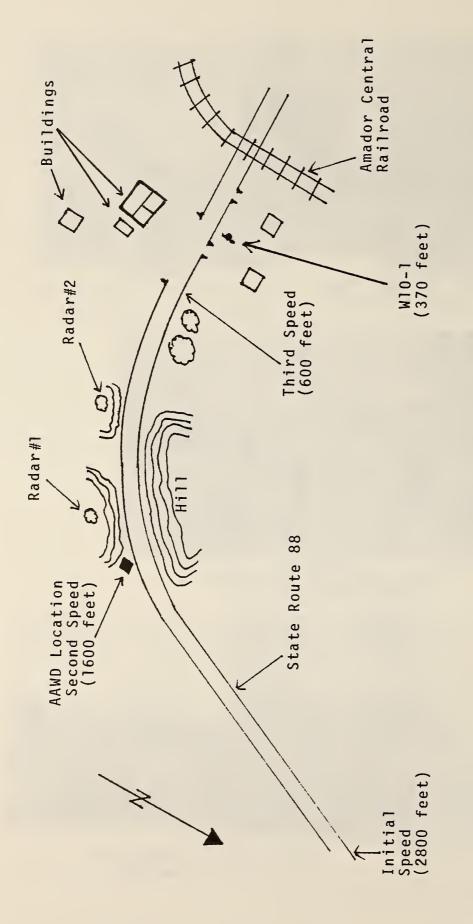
Plan View (Amador Central Railroad Crossing) The AAWD was installed, as shown in Figures 59 and 60, on the left shoulder of the roadway, 1600 feet (488 m) from the crossing. This position was chosen to place the AAWD in the center of the approaching driver's line of sight. Conventional right side of roadway positioning would have required the device to be located roughly 1850 feet (564 m) from the crossing, to maximize the driver's approach viewing distance of the device.
